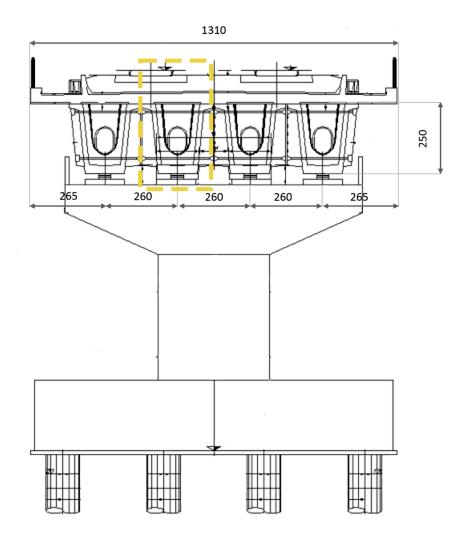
Pile elevation and bridge cross-section with indication of considered beam (dimensions in centimeters).
